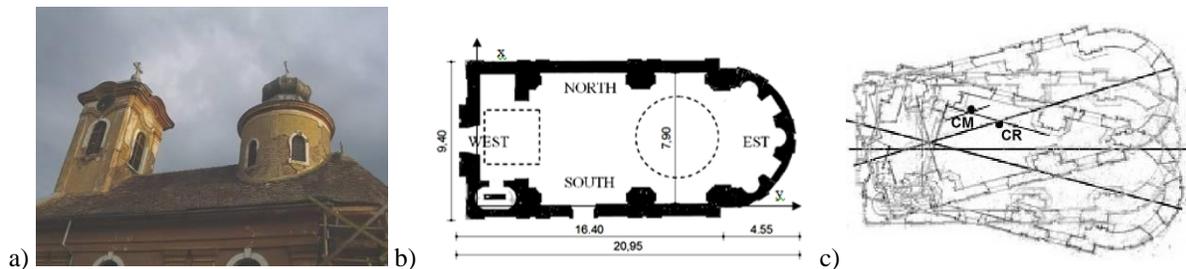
a) view of the towers; b) horizontal section; c) position of centre of mass and rigidity
